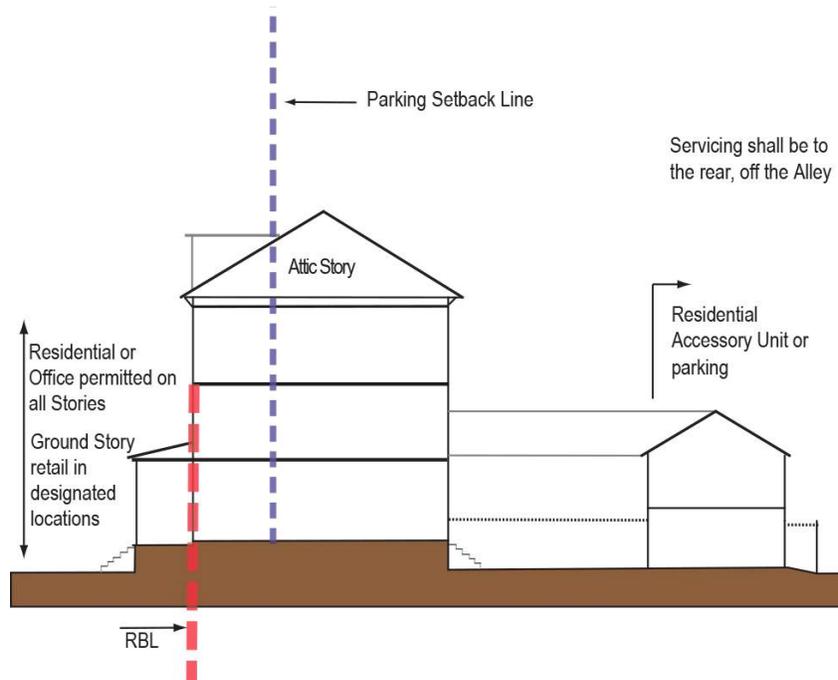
Townhouse/Small Apartment Use Standards
